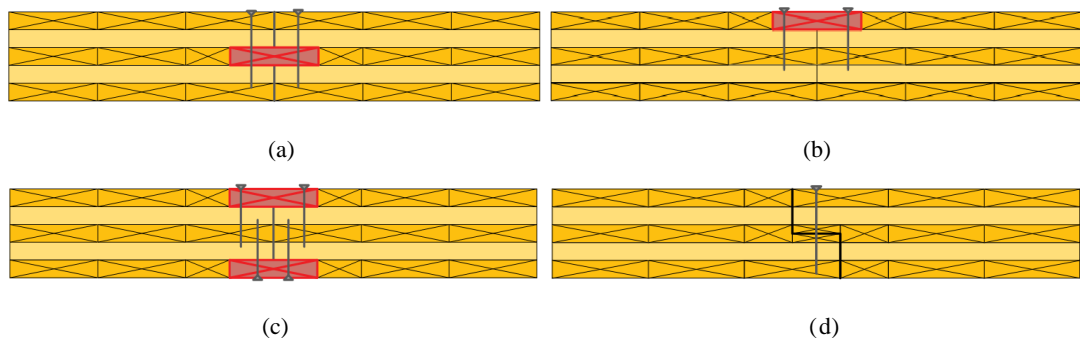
Examples of panel-to-panel connections: internal spline (a), single surface spline (b), double surface spline (c), half-lapped joint (d) [32].
